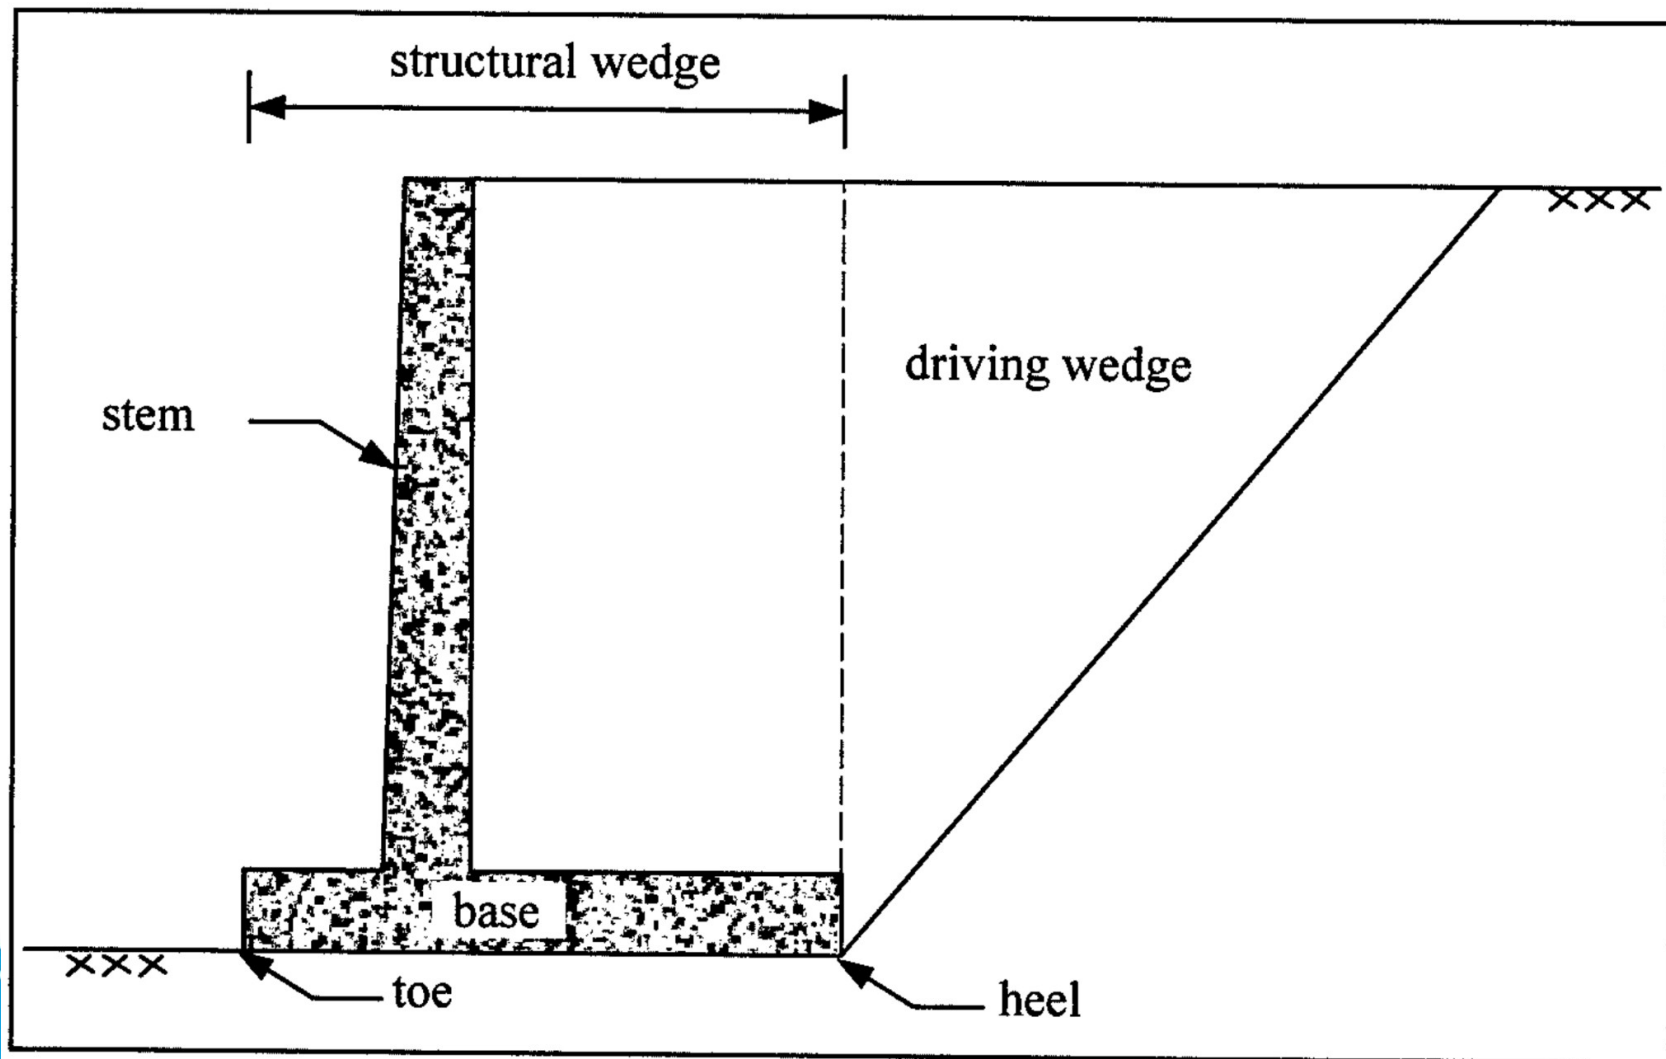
Typical Corps cantilever wall, including structural and driving wedges
